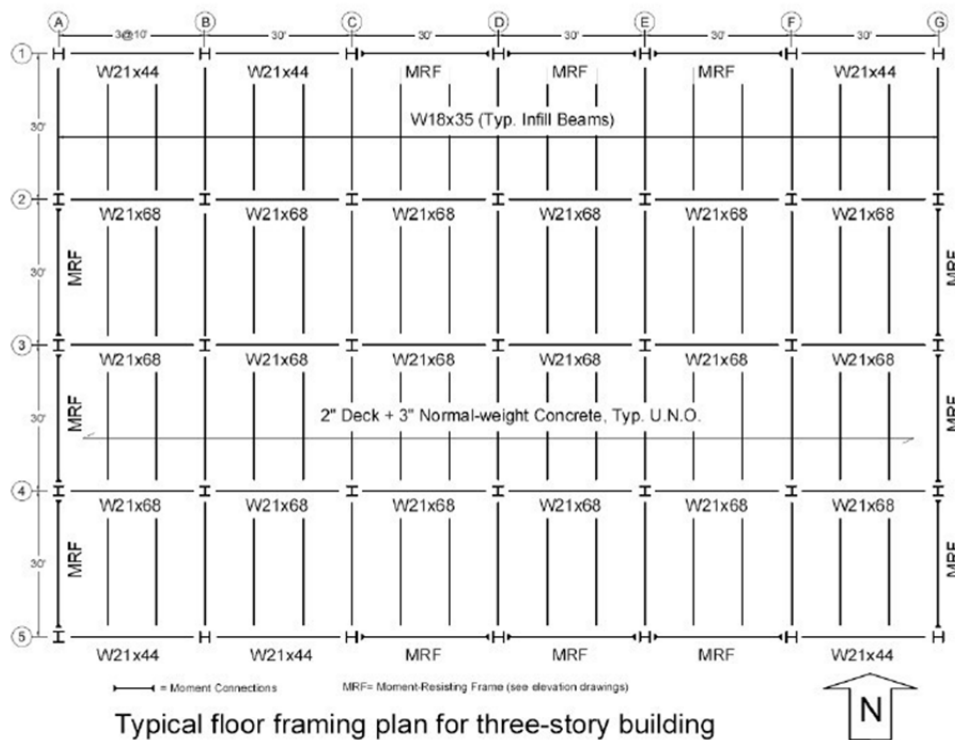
1 SAC-3: plan view (Hoffman, 2010)
